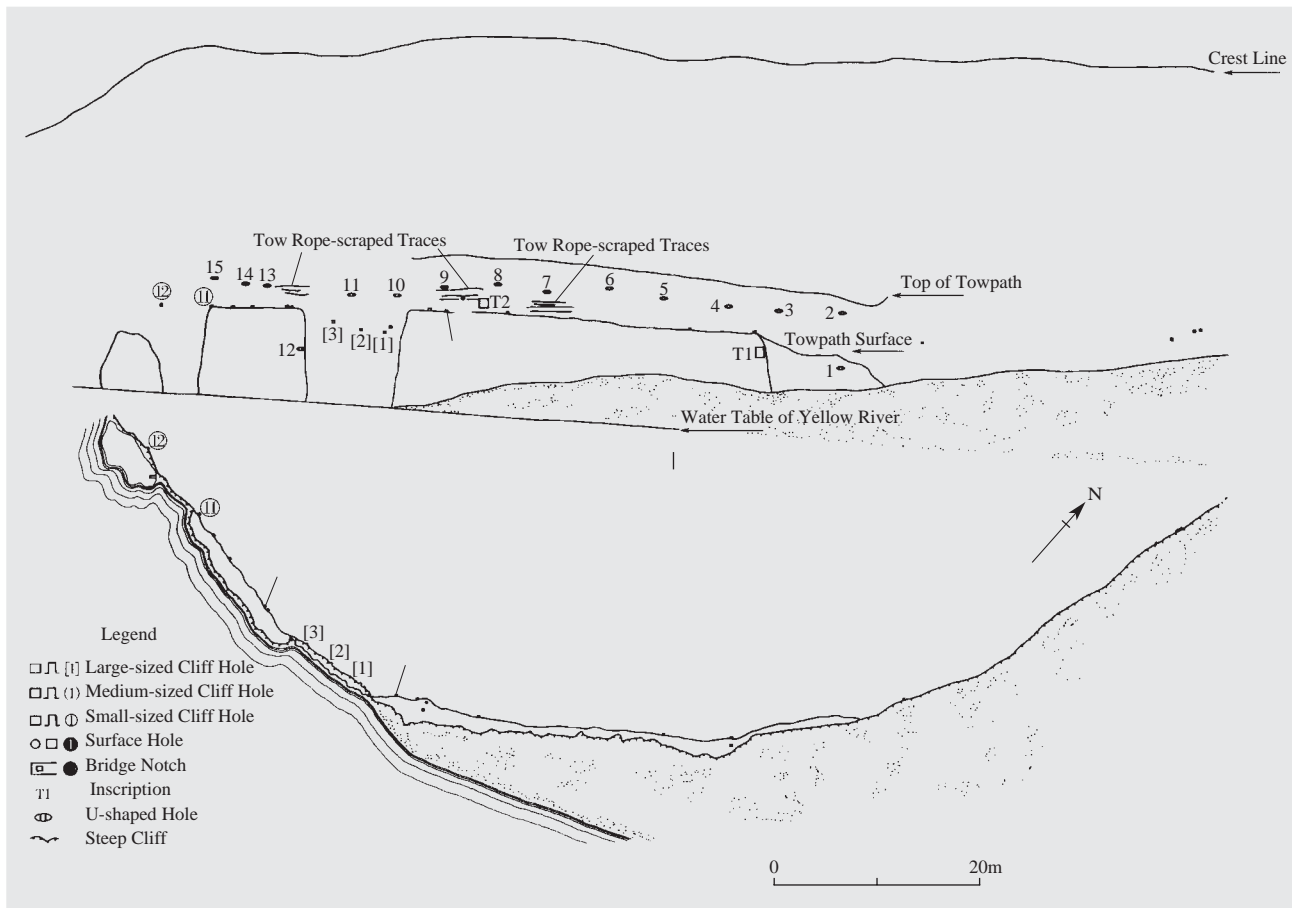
The Elevation and Plan of Towpath Remains of Section One
